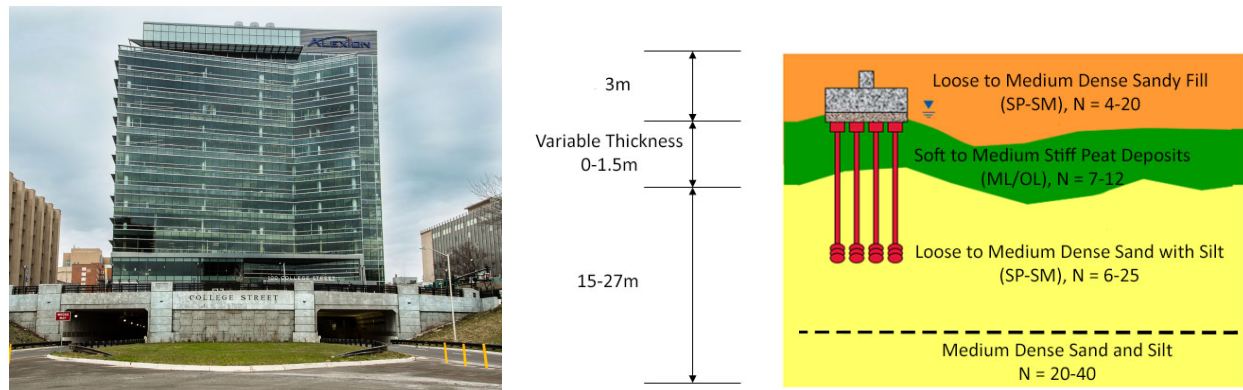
(a) Photo of completed structure with Route 34 below the building; (b) generalized soil profile
